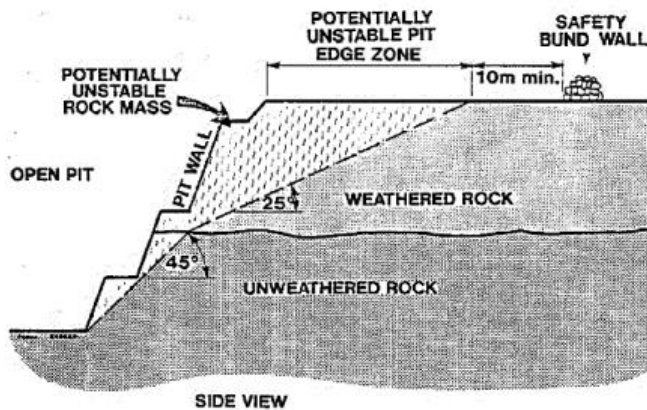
Evaluation of a zone of potential instability (reprinted from Department of Industry and Resources 1997, Safety Bund Walls Around Abandoned Open Pit Mines Guideline, Government of Western Australia)
